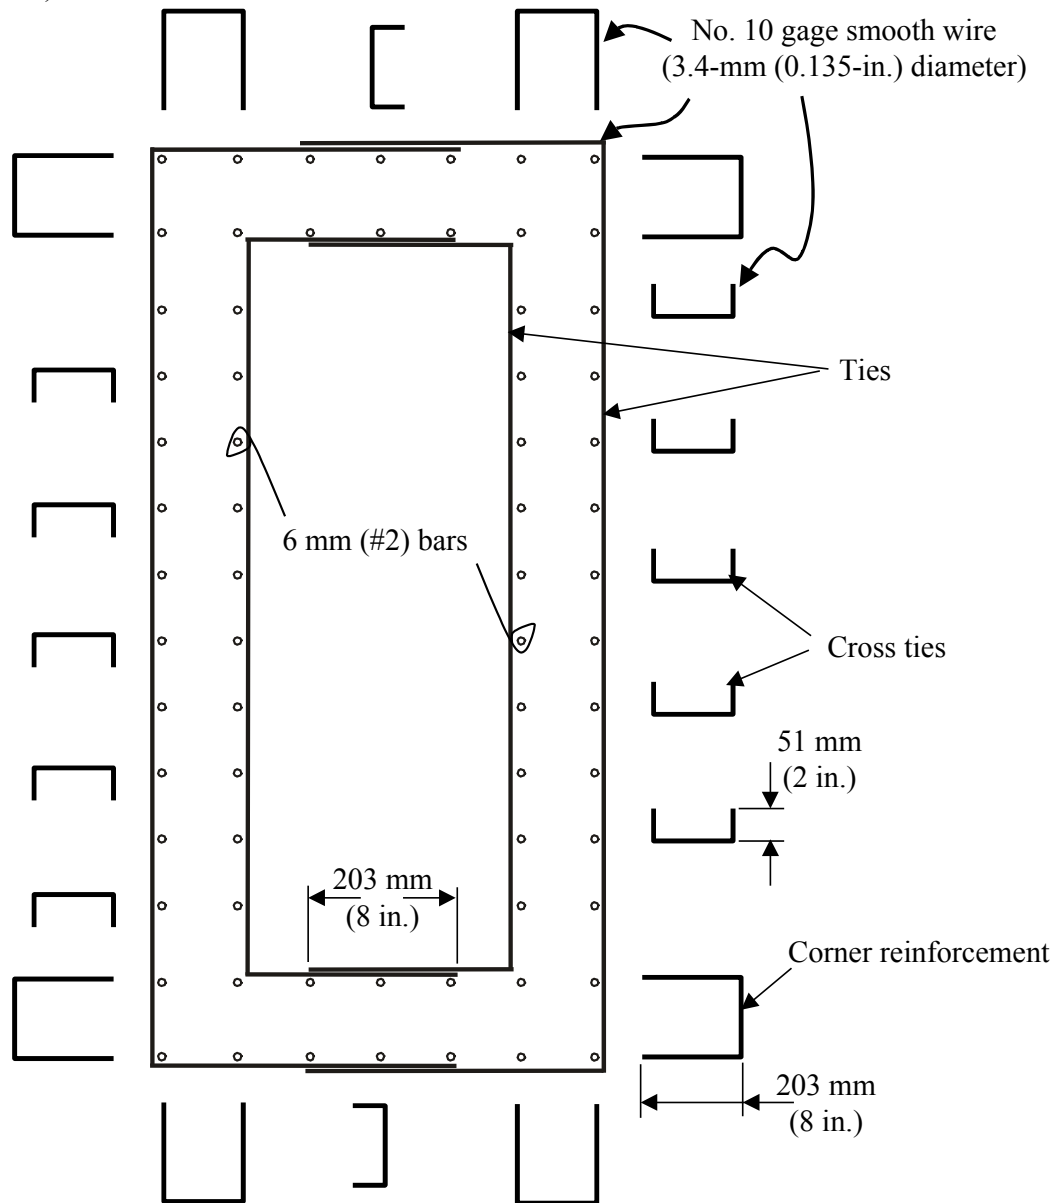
Typical Details for Transverse Reinforcement and Cross-Ties
